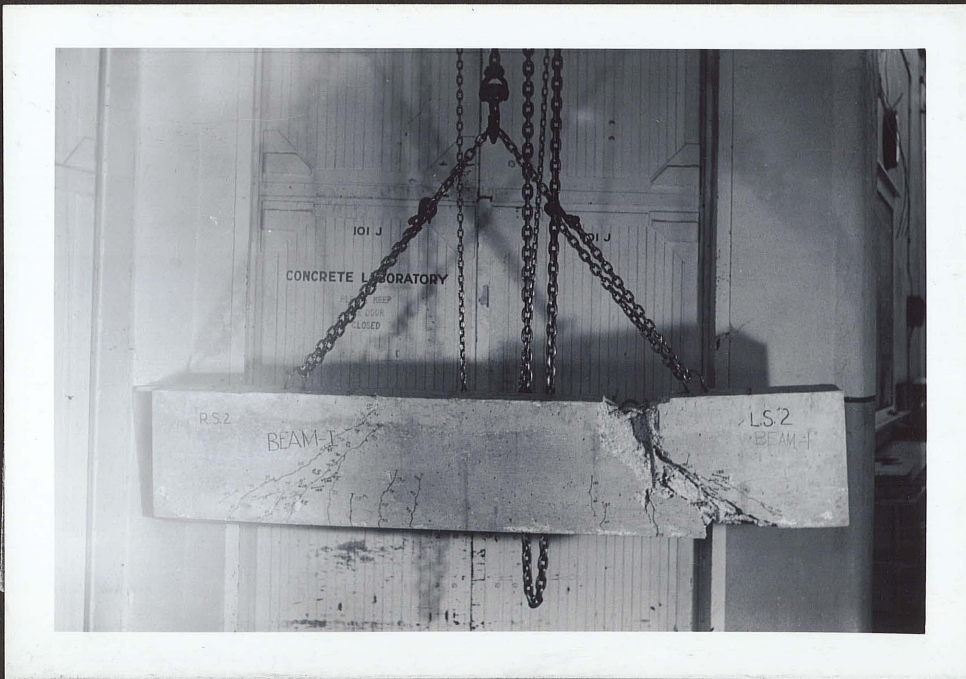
Beam 1 after Failure (side R.S.2-L.S.2)
